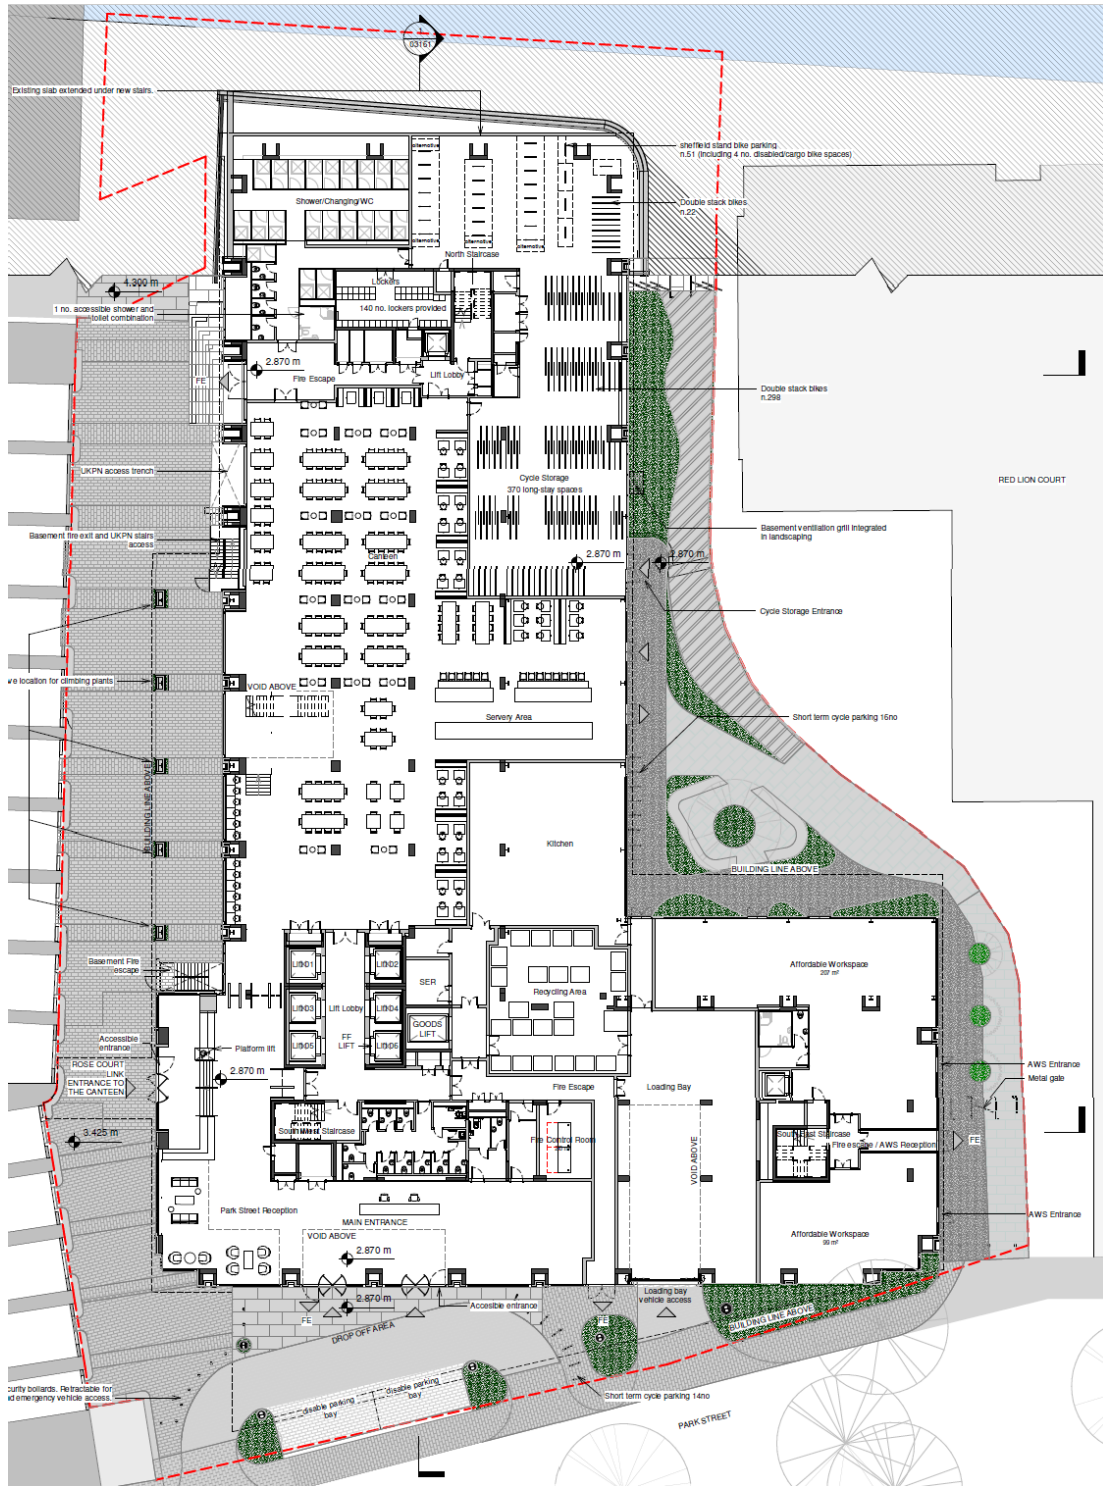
(above): Ground floor layout of the proposed development, including the landscaping of the surrounding external spaces.
